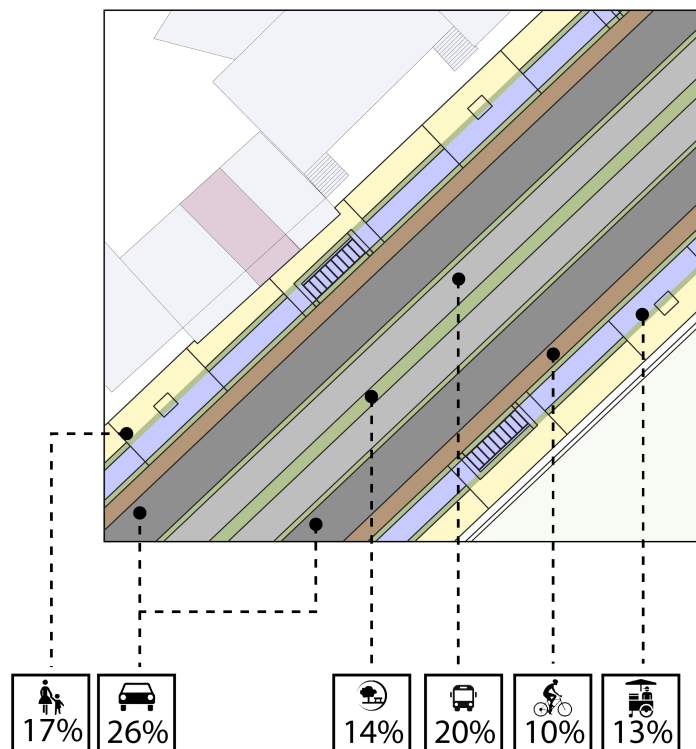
Proposed Street Space Distribution. Source: Original work based on above guidelines
